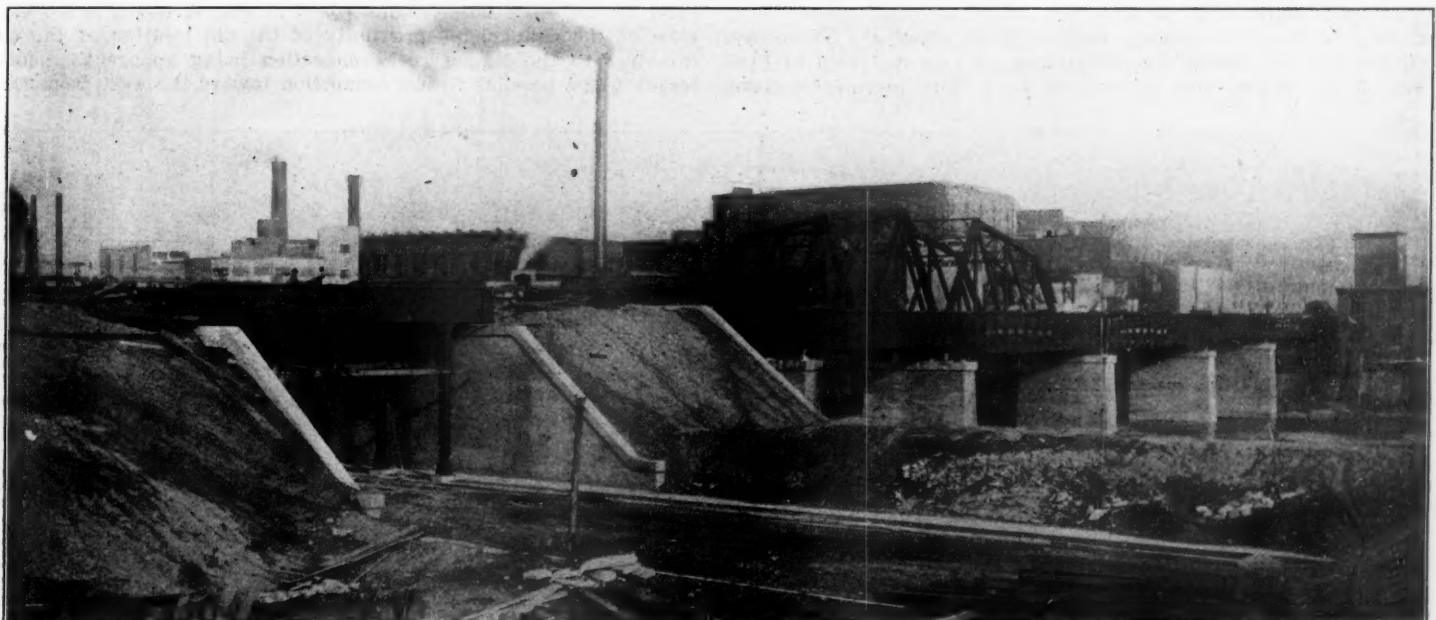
Parry Avenue and White River Bridges, Showing Big Four Bridge in Background.
